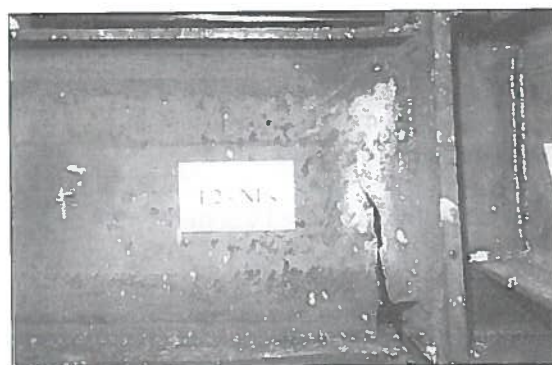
Typical failure of a beam-to-column connection.
